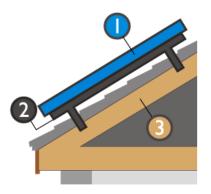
On-roof Installation (Horizon Renewables, 2013)
